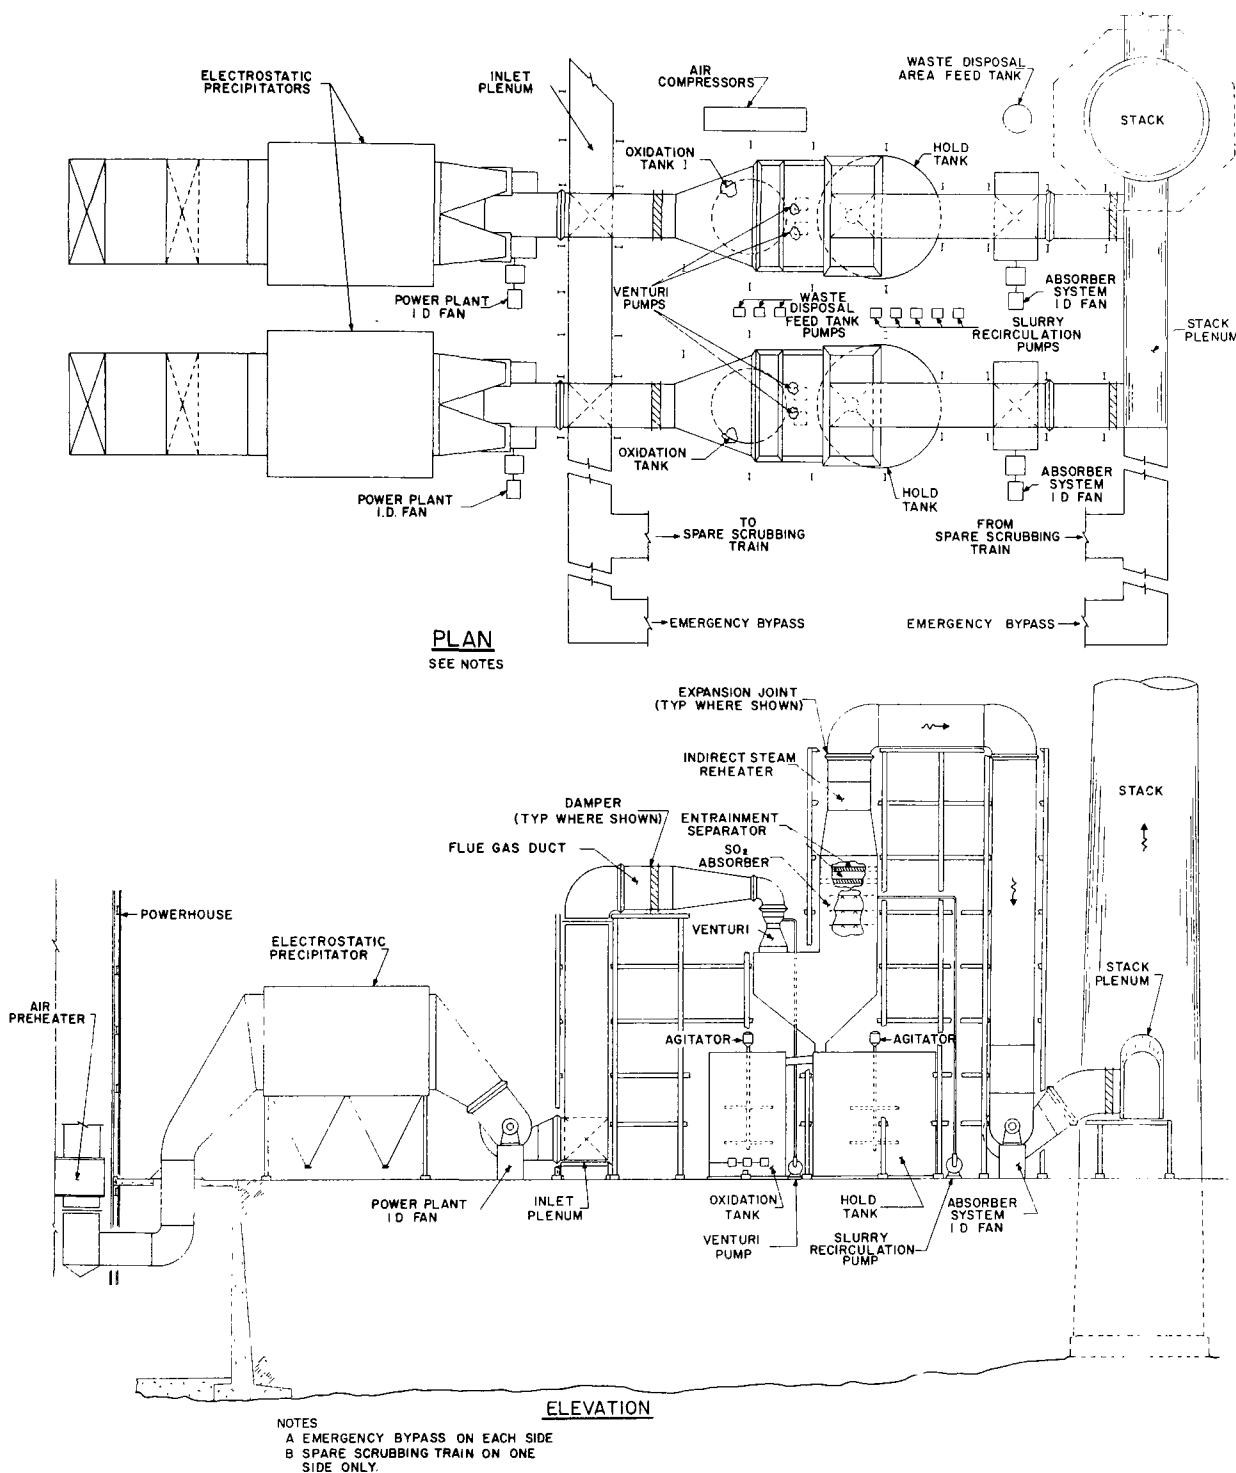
Plan and elevation for a venturi-spray tower with forced oxidation.
